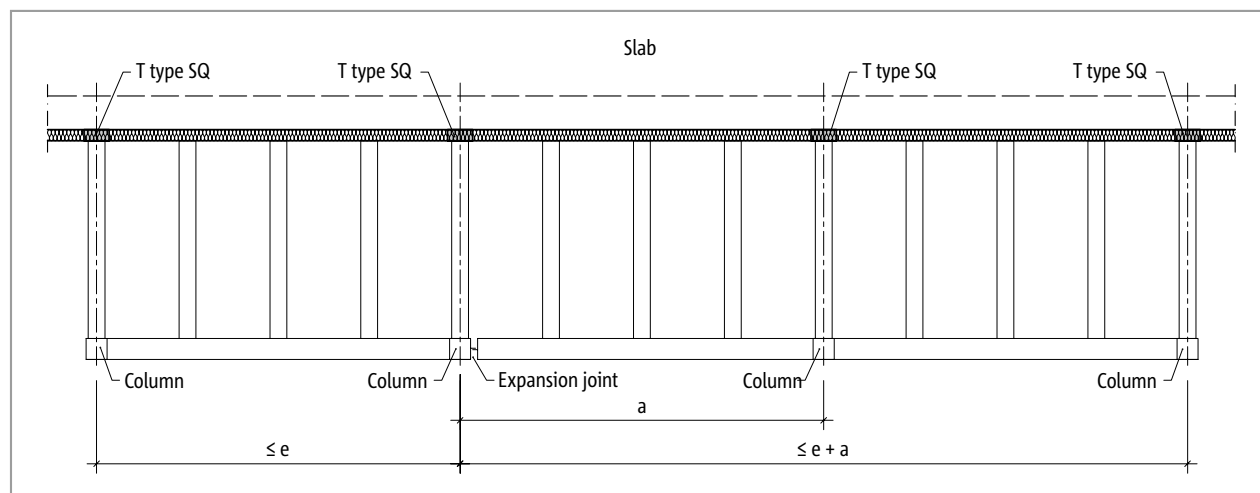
Schöck Isokorb® T type SQ: Maximum expansion joint spacing  $e$  and lateral overhang  $a$
